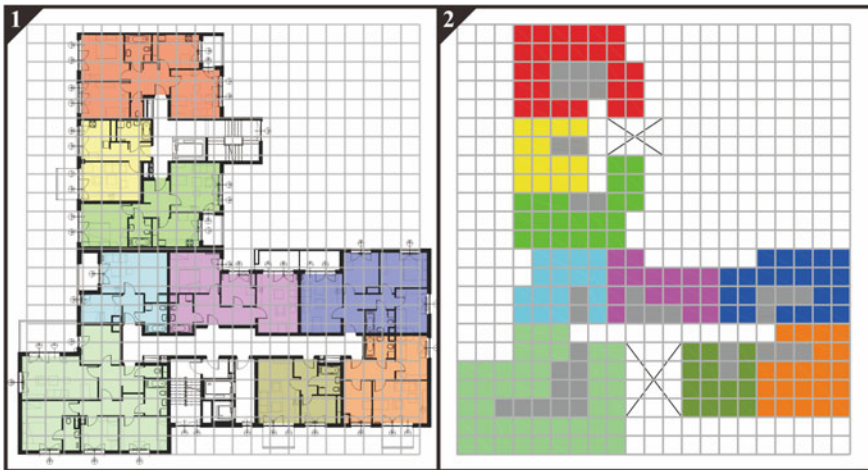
A typical floor of a multi-story upper-income multi-unit residential building; grid size: 1.68 m
